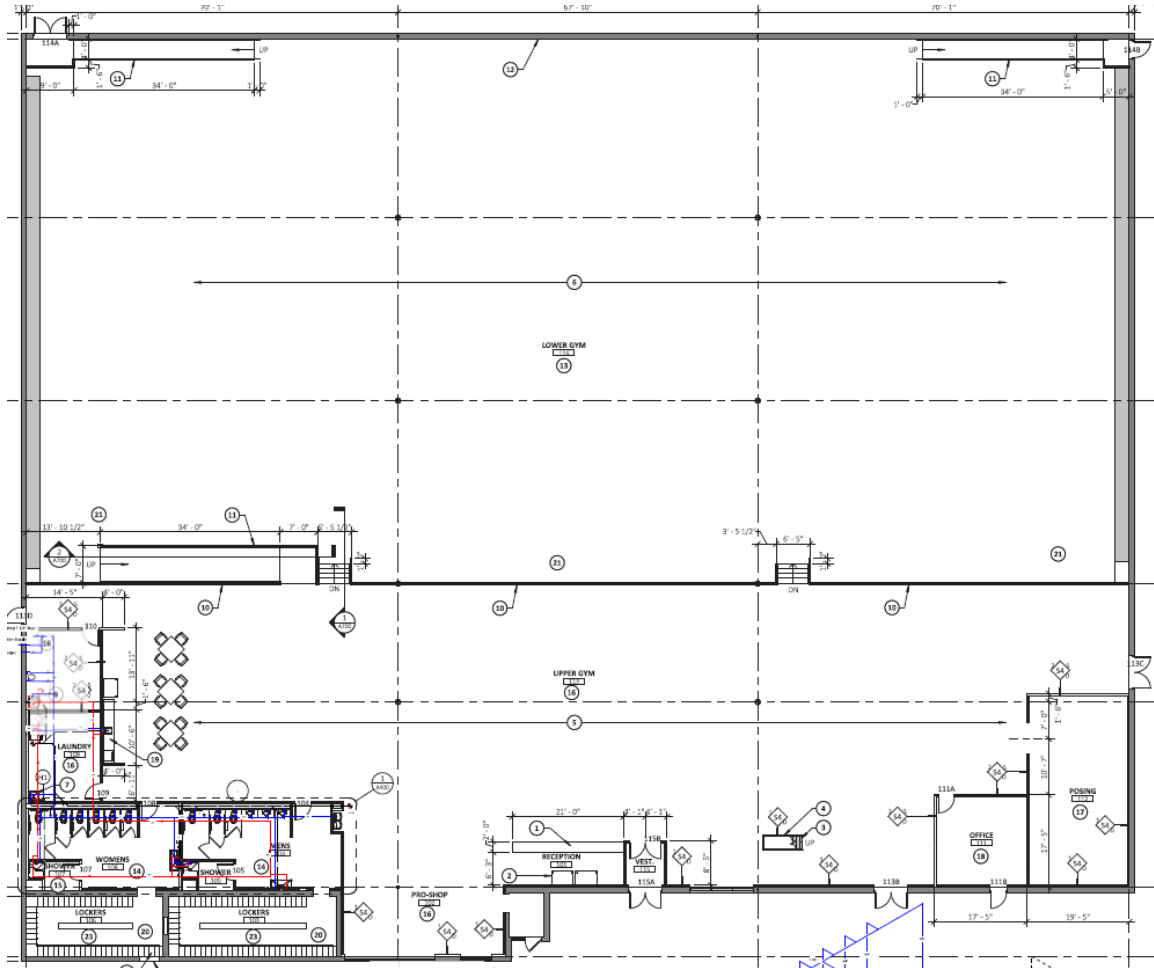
Proposed Los Campeones Gym Interior Floor Plan as per Submitted Plumbing Plans.
